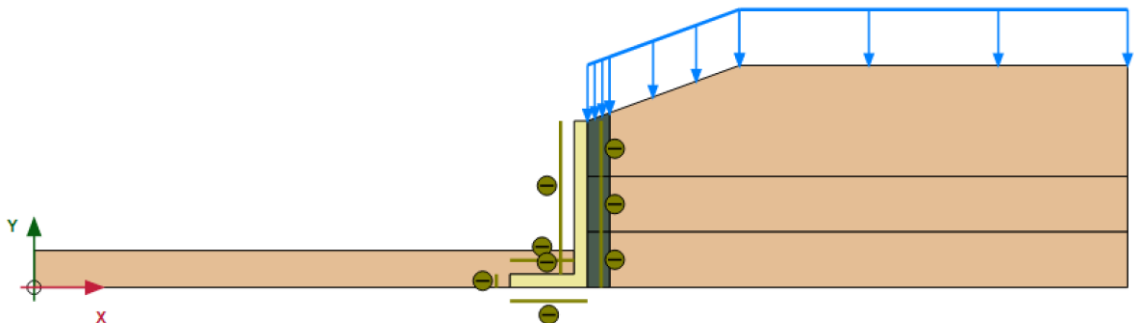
Retaining wall with backfill slope 20° and 0.6m TDA backfill
